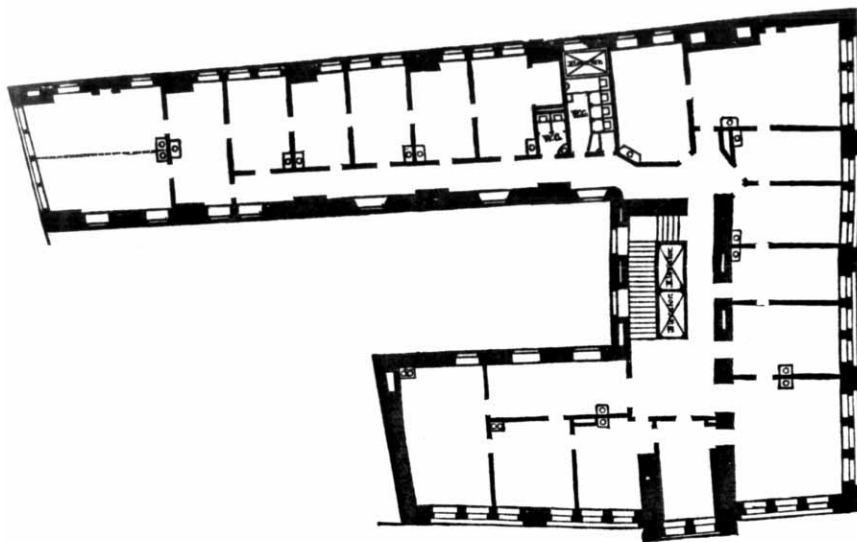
New York Tribune* Building, plan of typical office floor, 1881
